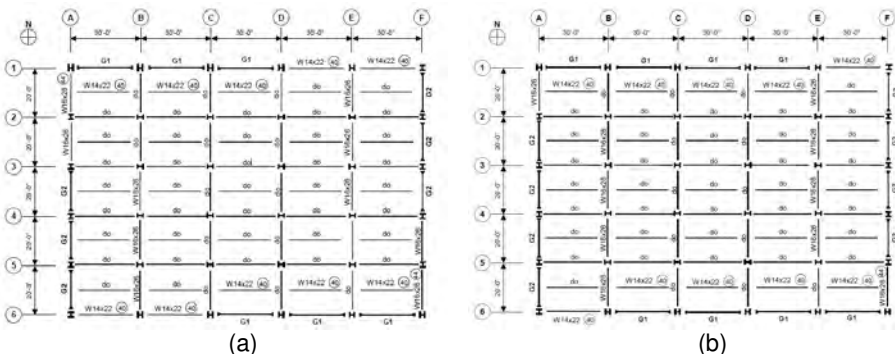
Plan layouts for (a) SDC C and (b) SDC D buildings (Sadek et al, 2013)
